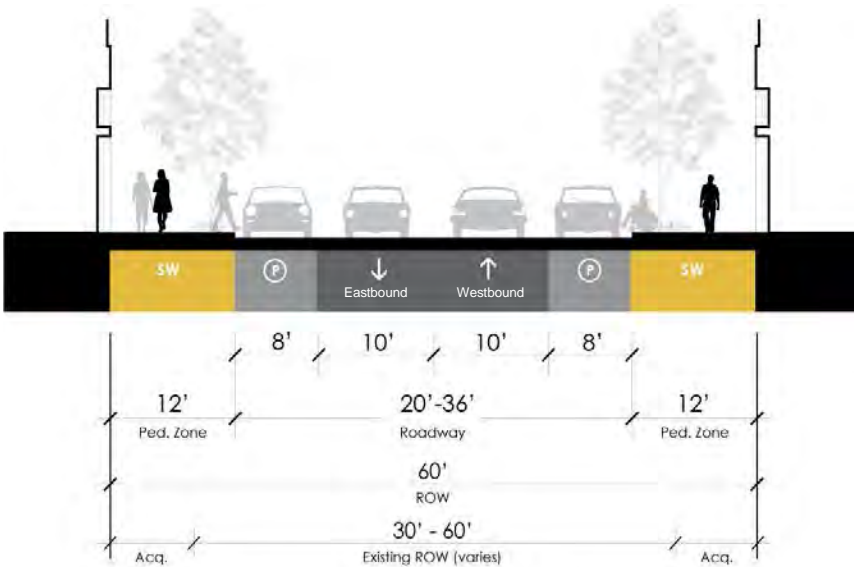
Retail Street Illustration (18th Street View Looking West to Main Street)
